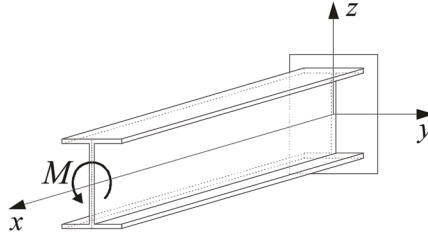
The case of twisted concentrated moment applied to I-section cantilever thin-walled beam
